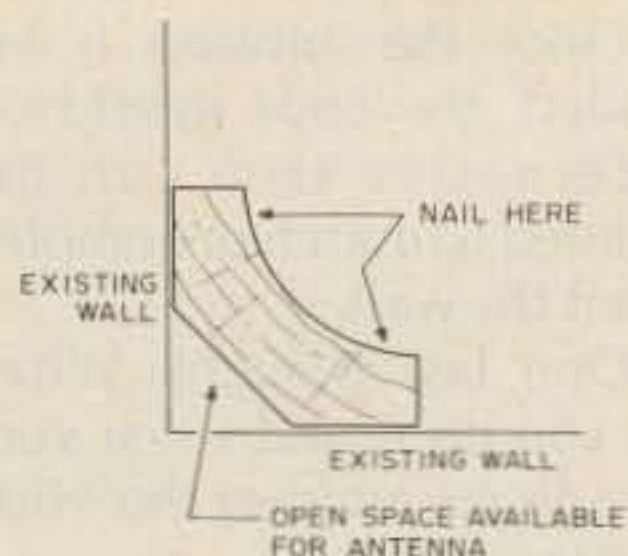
Profile view of a piece of cove molding mounted in an inside corner. Note the open space available behind the molding.
